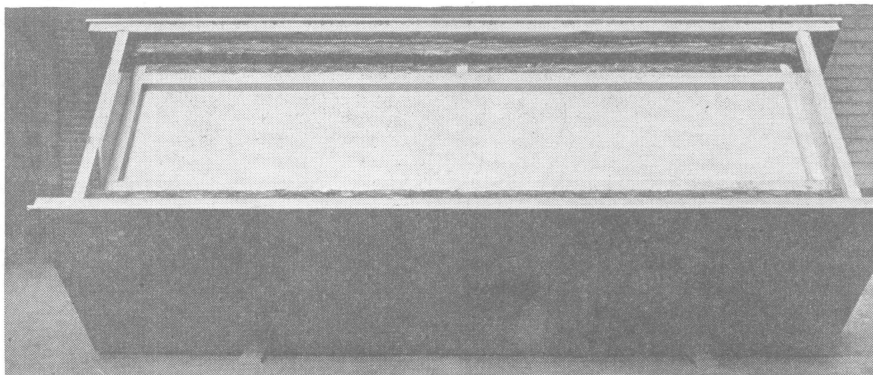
Both sides have been insulated and panels fastened in place ready to insulate the bottom.
